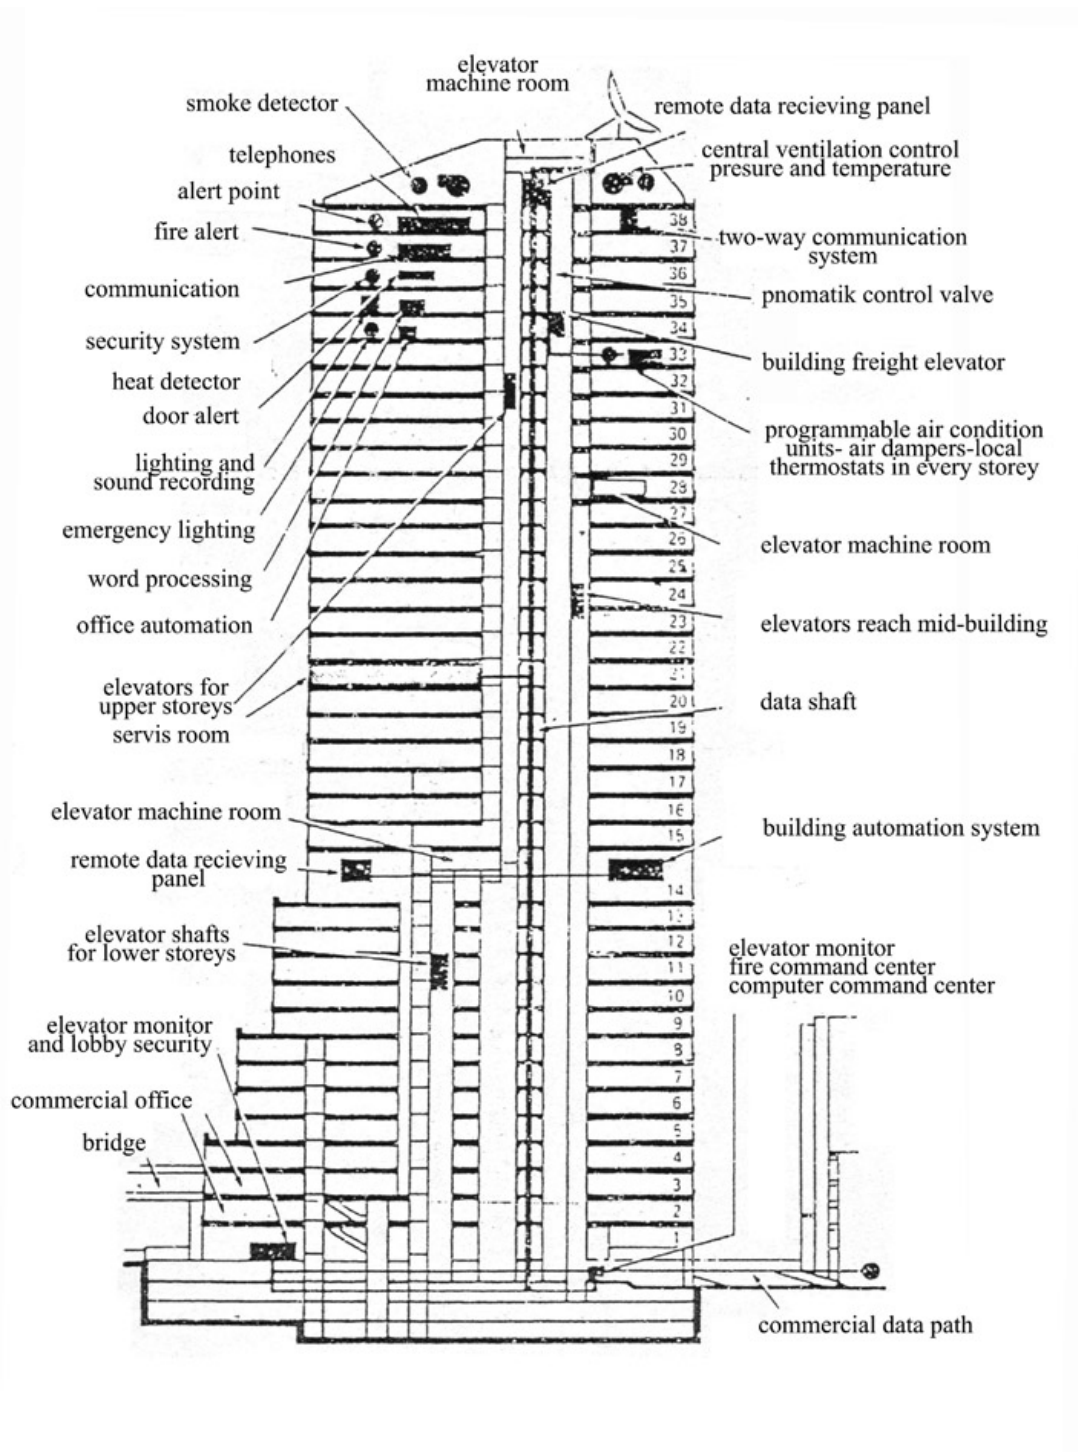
First Intelligent Building, Connecticut, USA, 1981 (Source: Özer, 1996)
